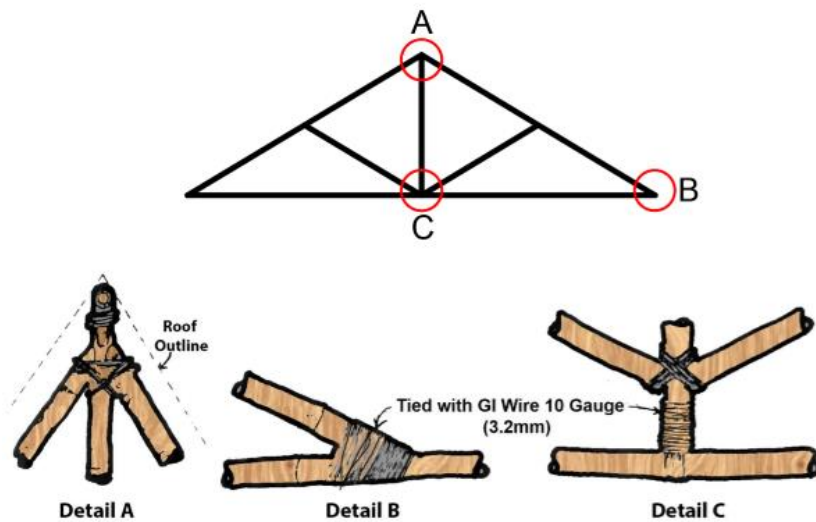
CONNECTION DETAILS OF ROOF TRUSS
